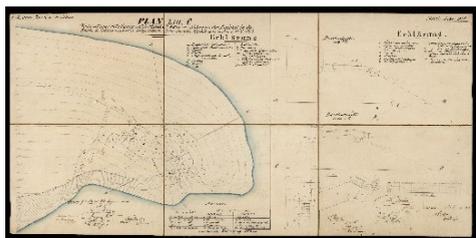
Drawing C – Fort Oštro, 1850. (HDA)
